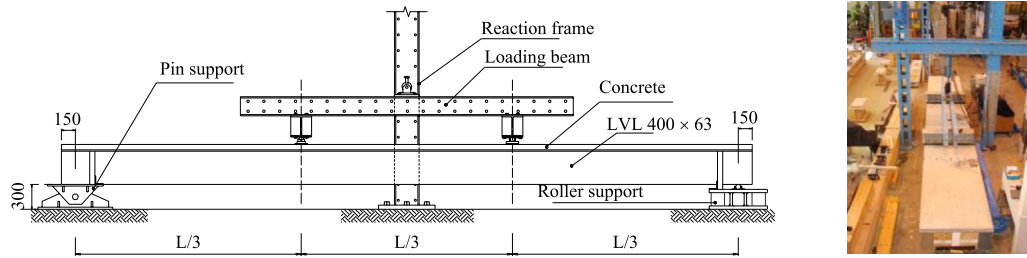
Typical 4-point bending test set-up with photo (right) of a beam under the reaction frame ready to be tested (dimensions in mm).
